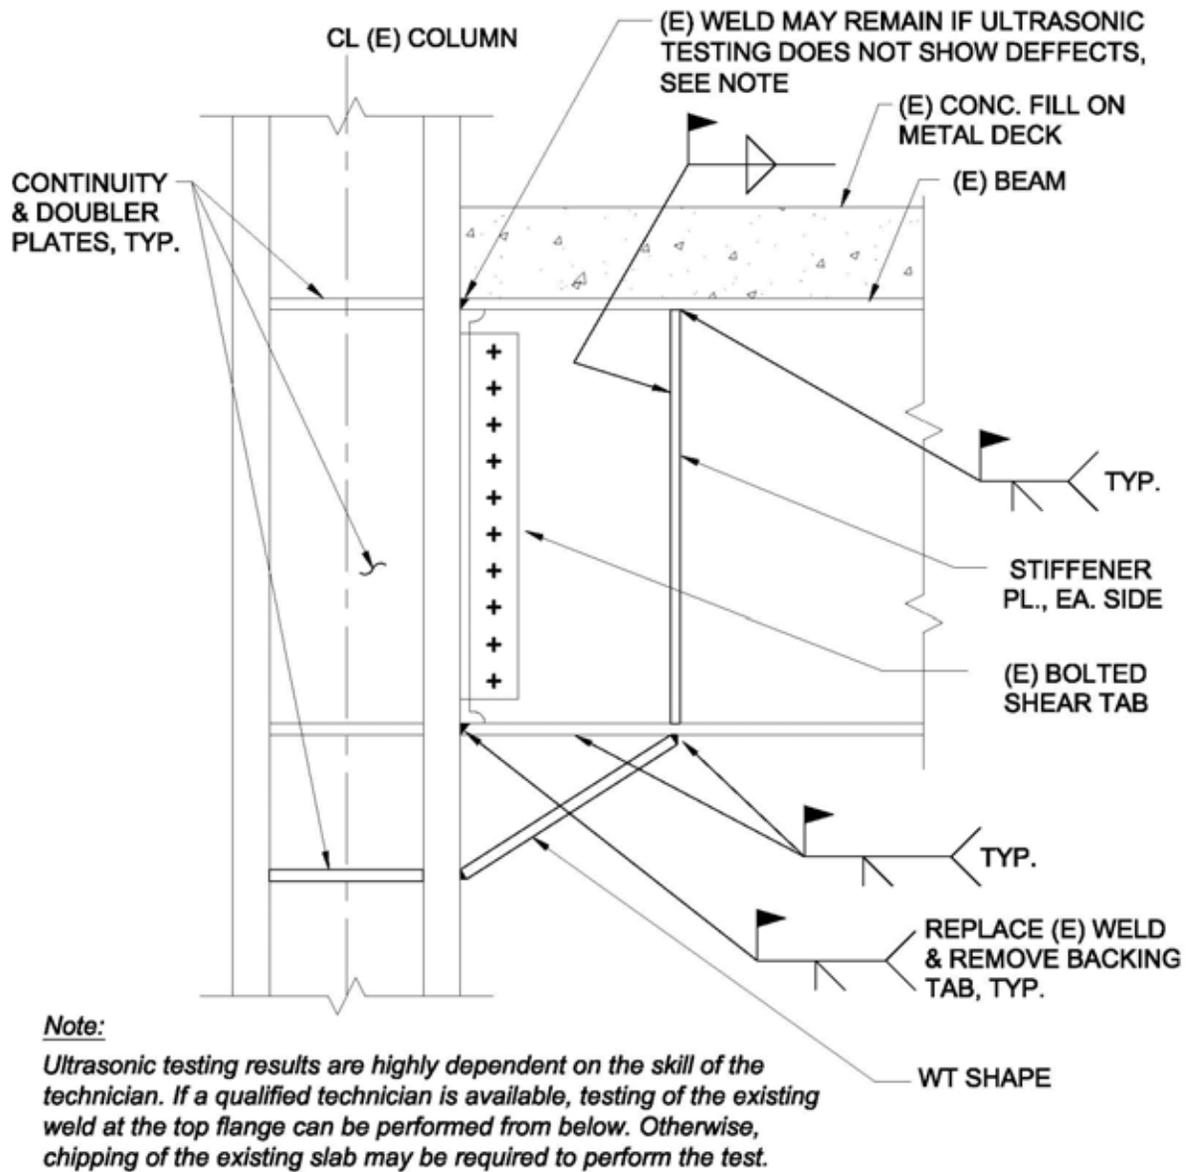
Welded Haunch at Bottom Flange of Existing Beam
